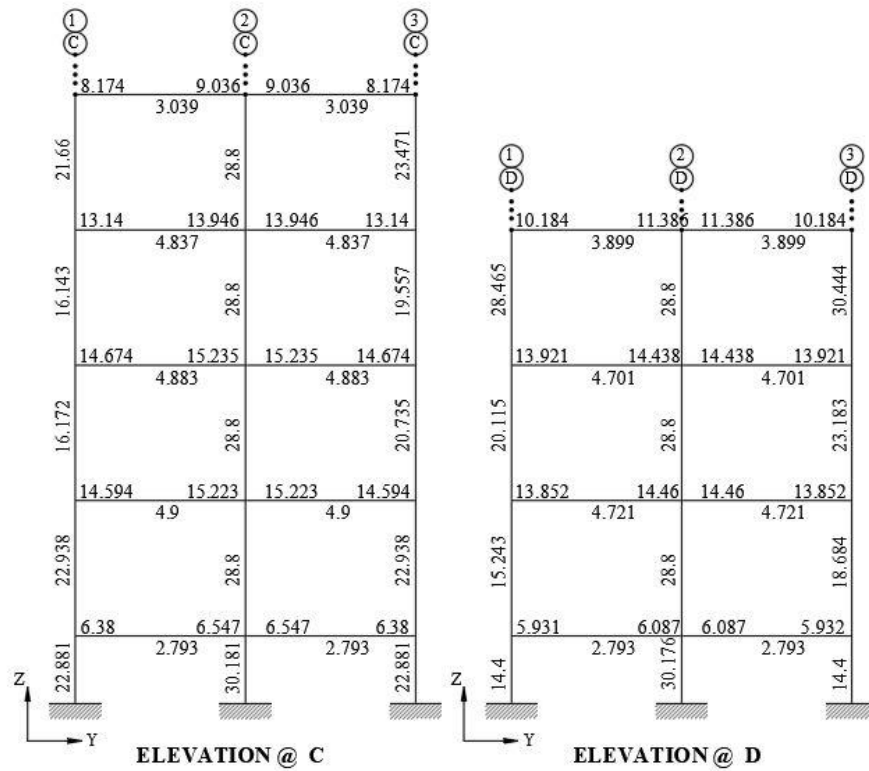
Reinforcement details for 4 storey building for grid C & D
